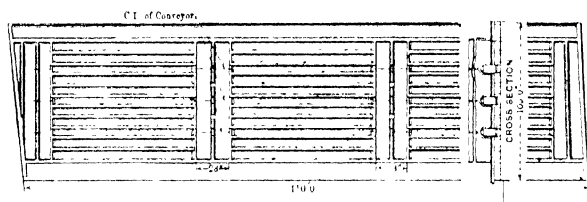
Foundation plan of cement stock-house, Hudson Portland Cement Co.
